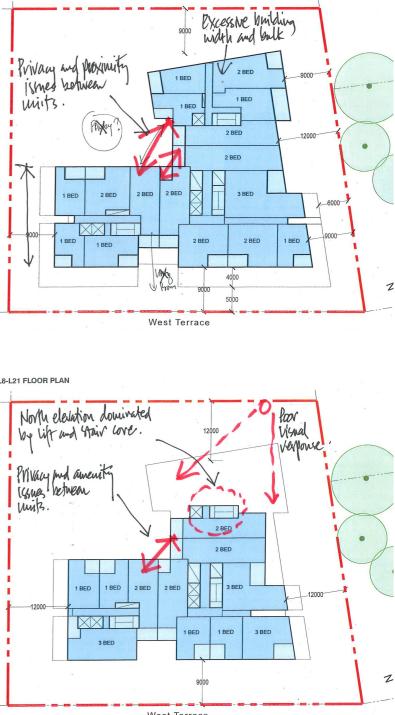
Design development is required to address privacy, amenity, bulk and visual appearance on the eastern elevation
